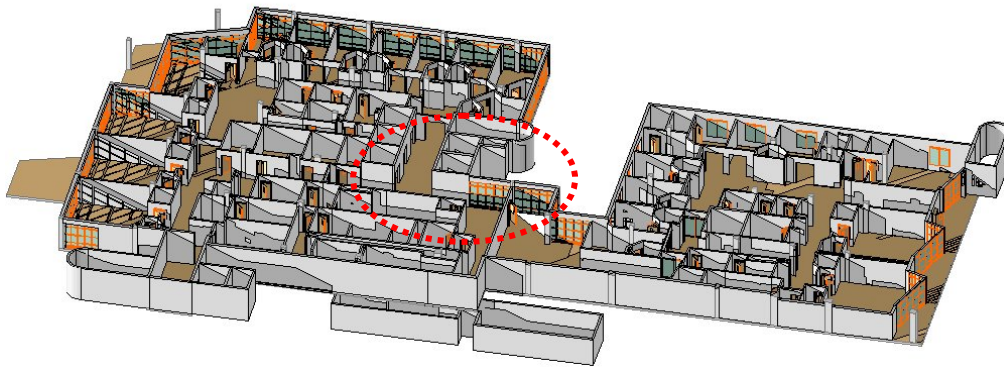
3D view of typical floor of Building no. 10, Royal Prince Alfred Hospital, Sydney.
